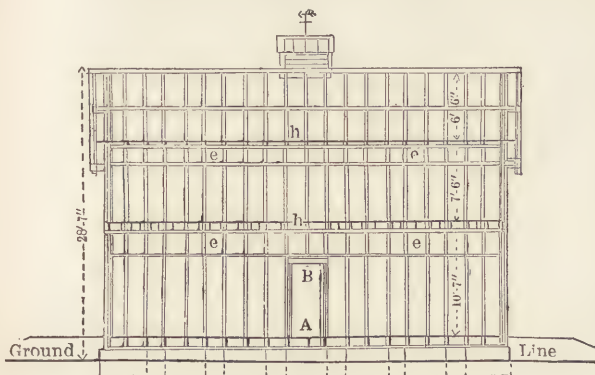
Longitudinal Section (through Alley or Drive-way).—A, Position of Sheller in Alleyway; B, Opening to Crib; e e e, Continuous Openings for Filling Crib; h h, Well-holes through Middle and Upper Floor.
